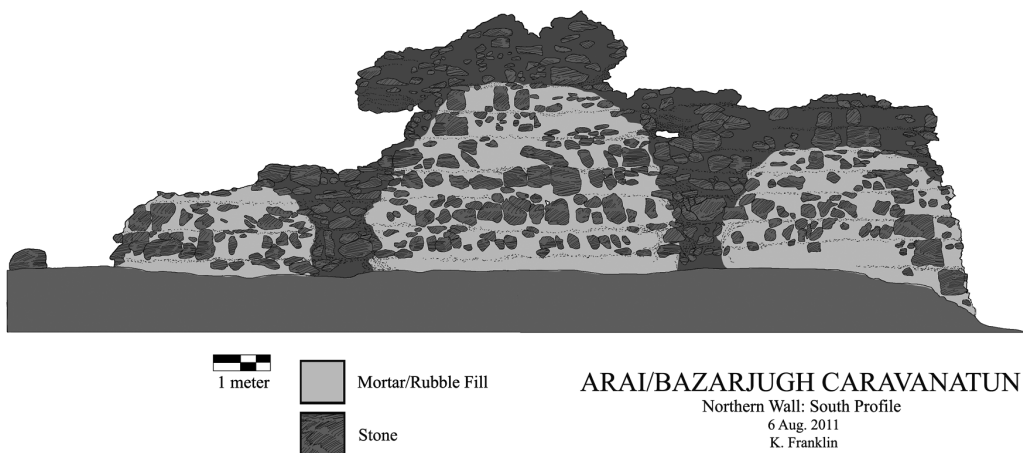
Architectural drawing of standing architecture at Arai-Bazarjugh, indicating traces of the arch and roof structure.
